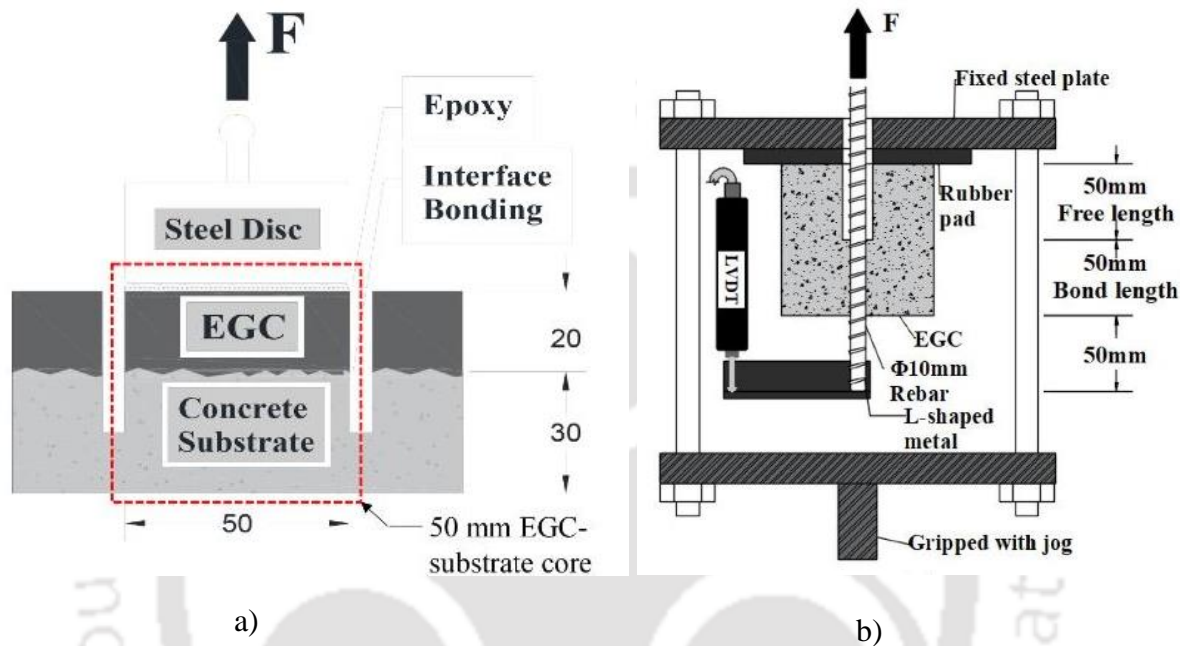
Bond strength test: a) Concrete pull of test b) Rebar pull out test
